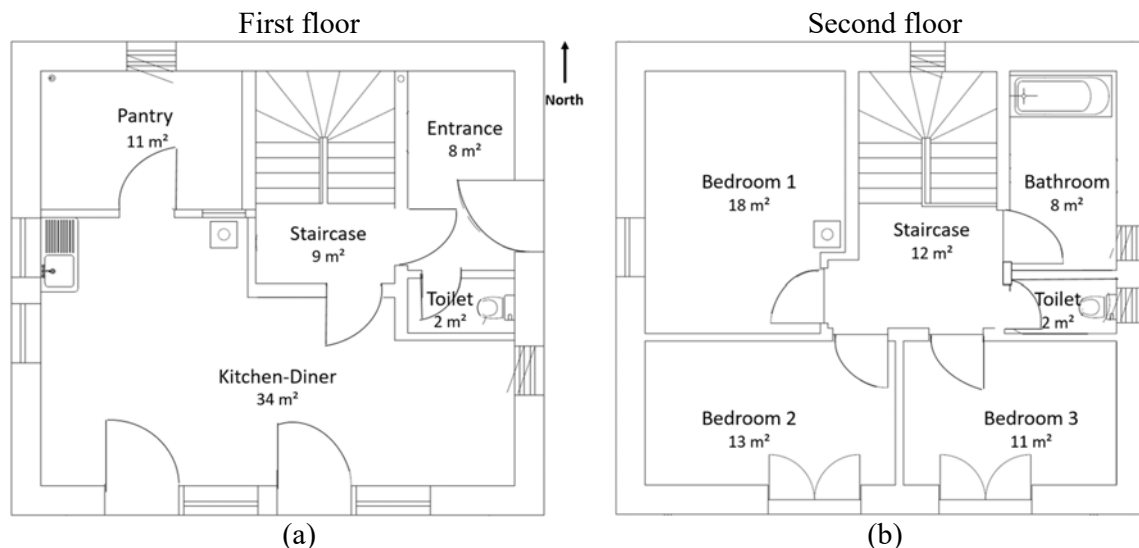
Plan of the house used in simulation (a) first floor and (b) second floor.
